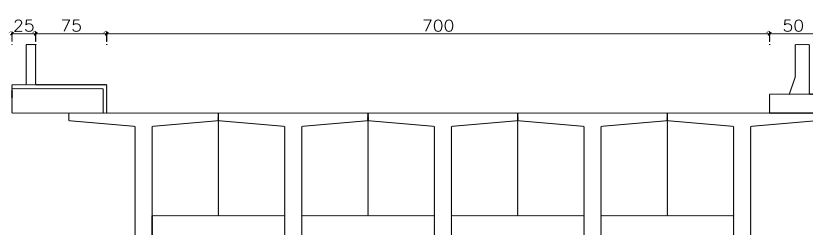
The cross-section sizing and shaping of bridge (cm)
